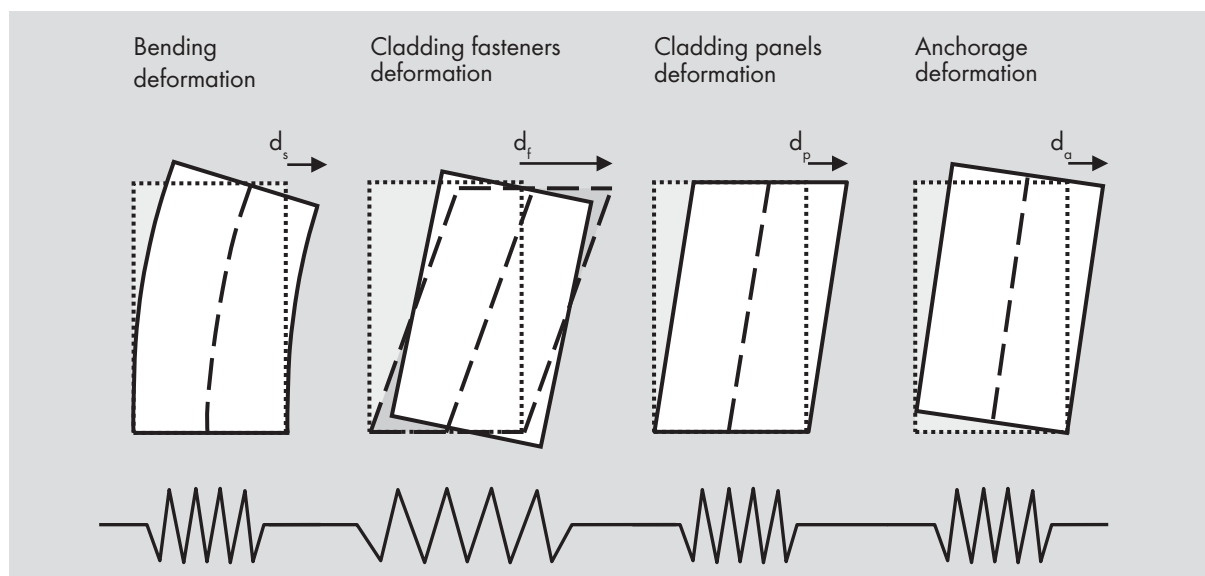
Deformation contributions of a wall with cladding under lateral loads
